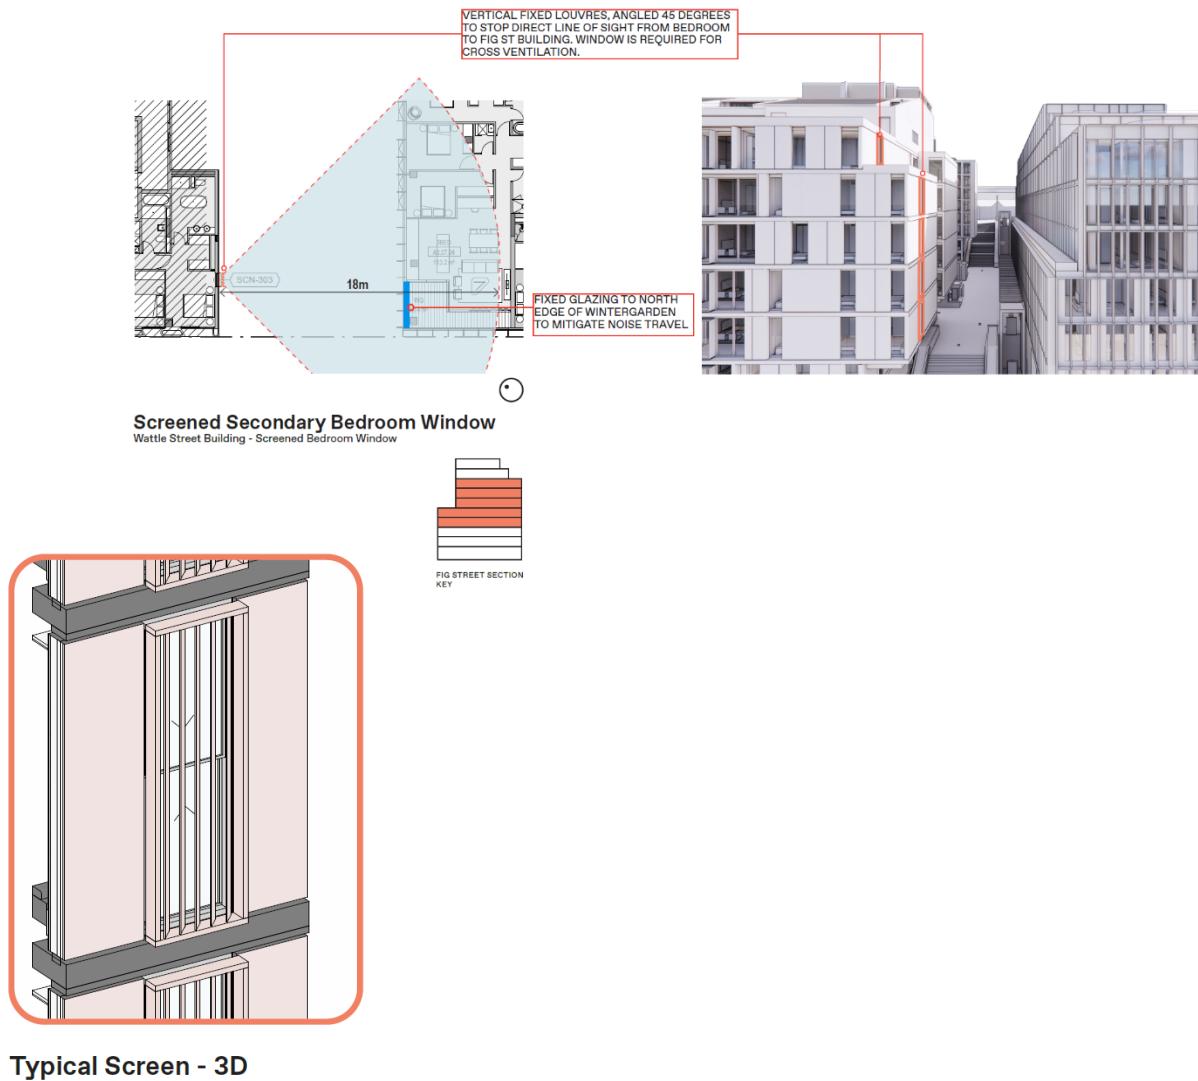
Privacy protection measures - screens: Fig Street Building to Wattle Street Building
